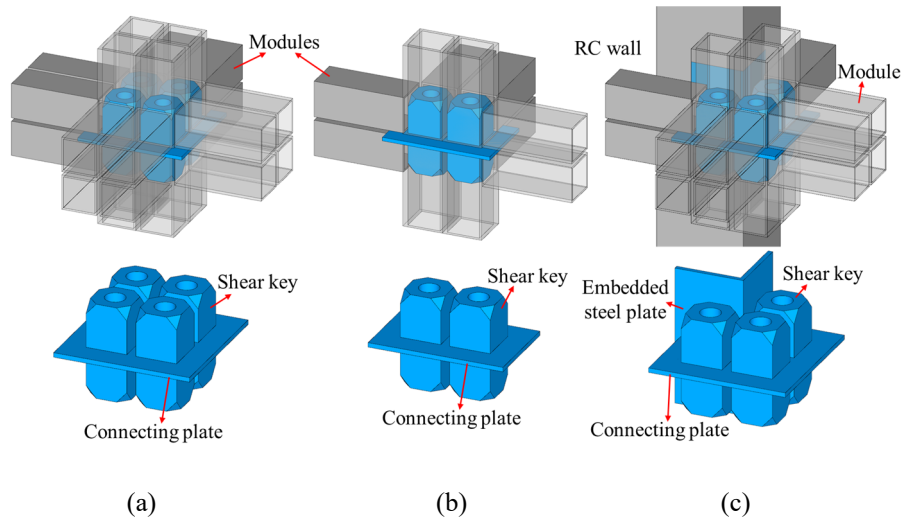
Connection arrangements: (a) internal inter-module connections, (b) external inter-module connections, and (c) connections between modules and RC walls
